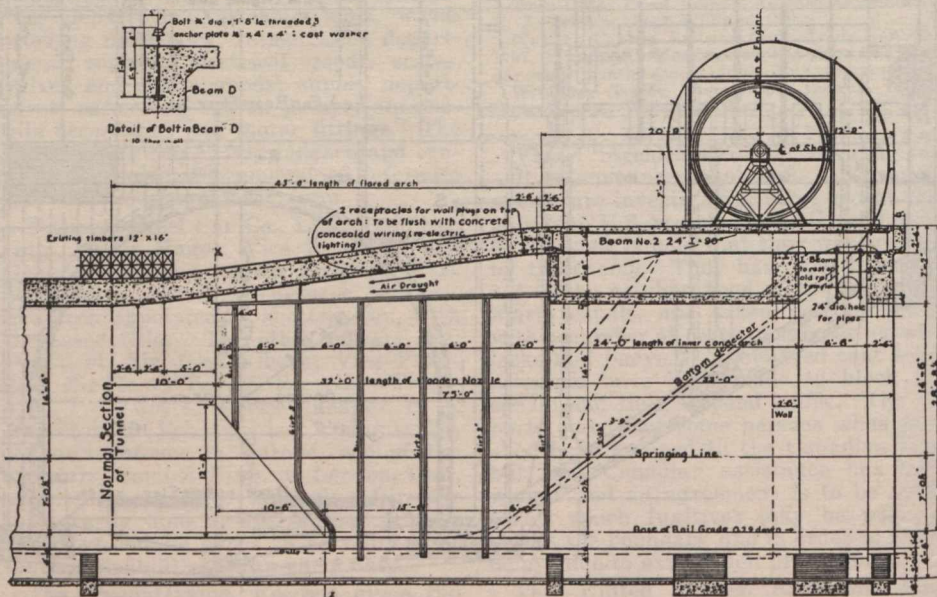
Connaught Tunnel Ventilation, Longitudinal Section.
